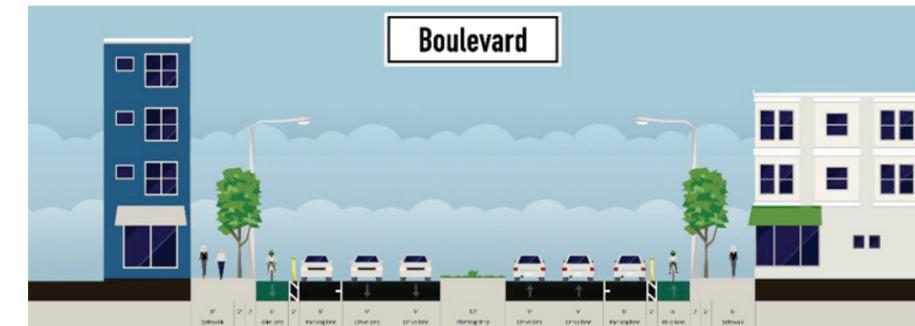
Medium Intensity Plan, Boulevard; Source: Section generated from streetmix.net/
